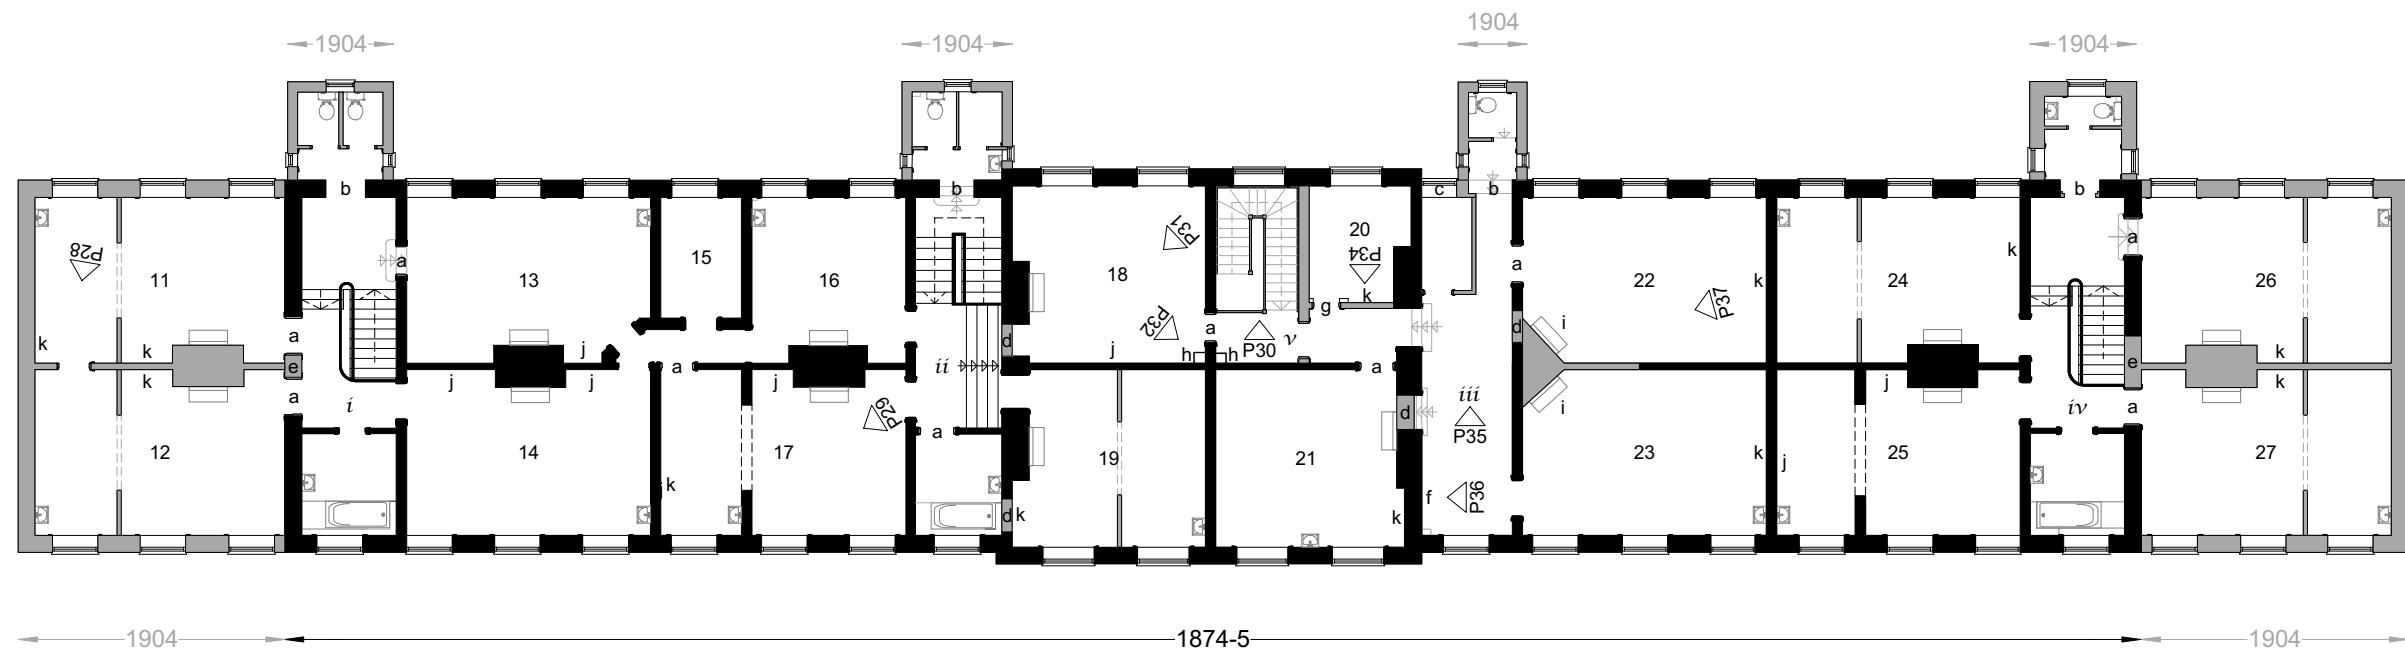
General plan of Royal Artillery Barracks, undated design drawing (EHA 95/1431).
